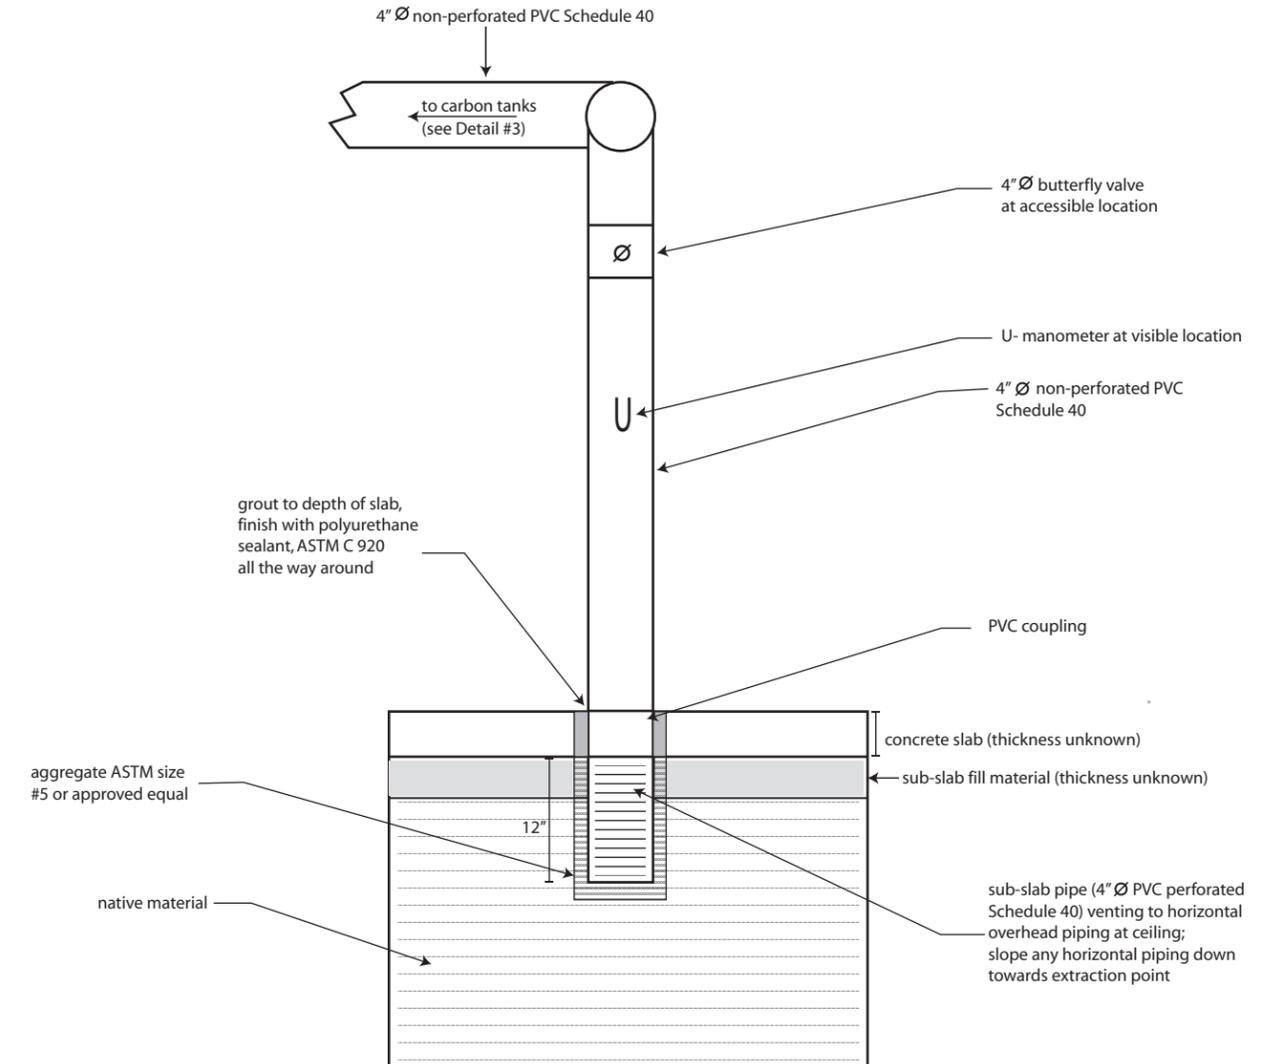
A: Enhanced Subslab Depressurization System Details #1 and #2
